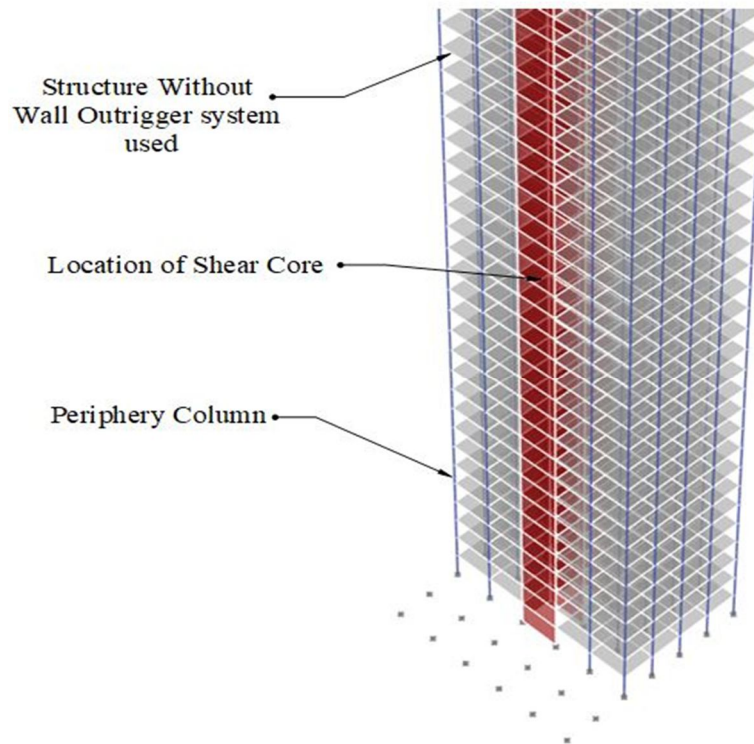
Without wall outrigger - 3D cutout view of the tall structure
